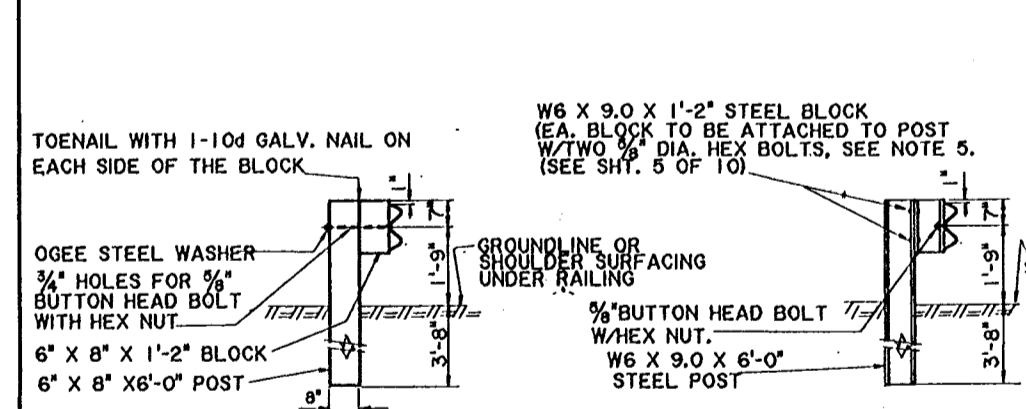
X 9.0 STEEL POSTS AND BLOCKS
